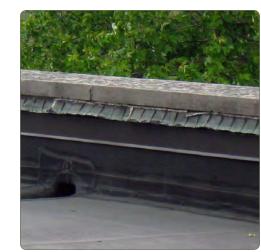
Roof coping does not use standard techniques and suspect to failure.
